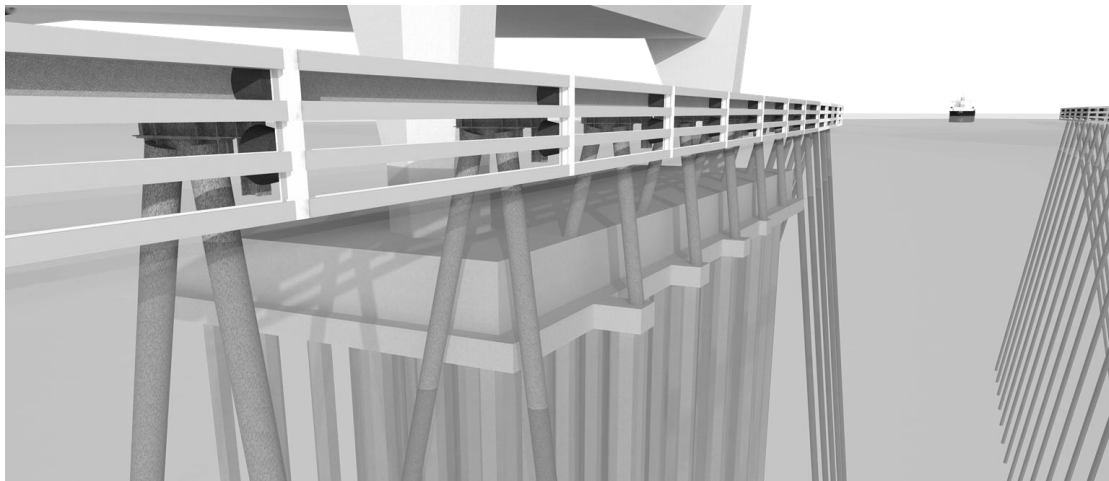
Piles supporting the protective piers are attached to the bridge foundation at the opening, giving a stiffer response of the piers.
